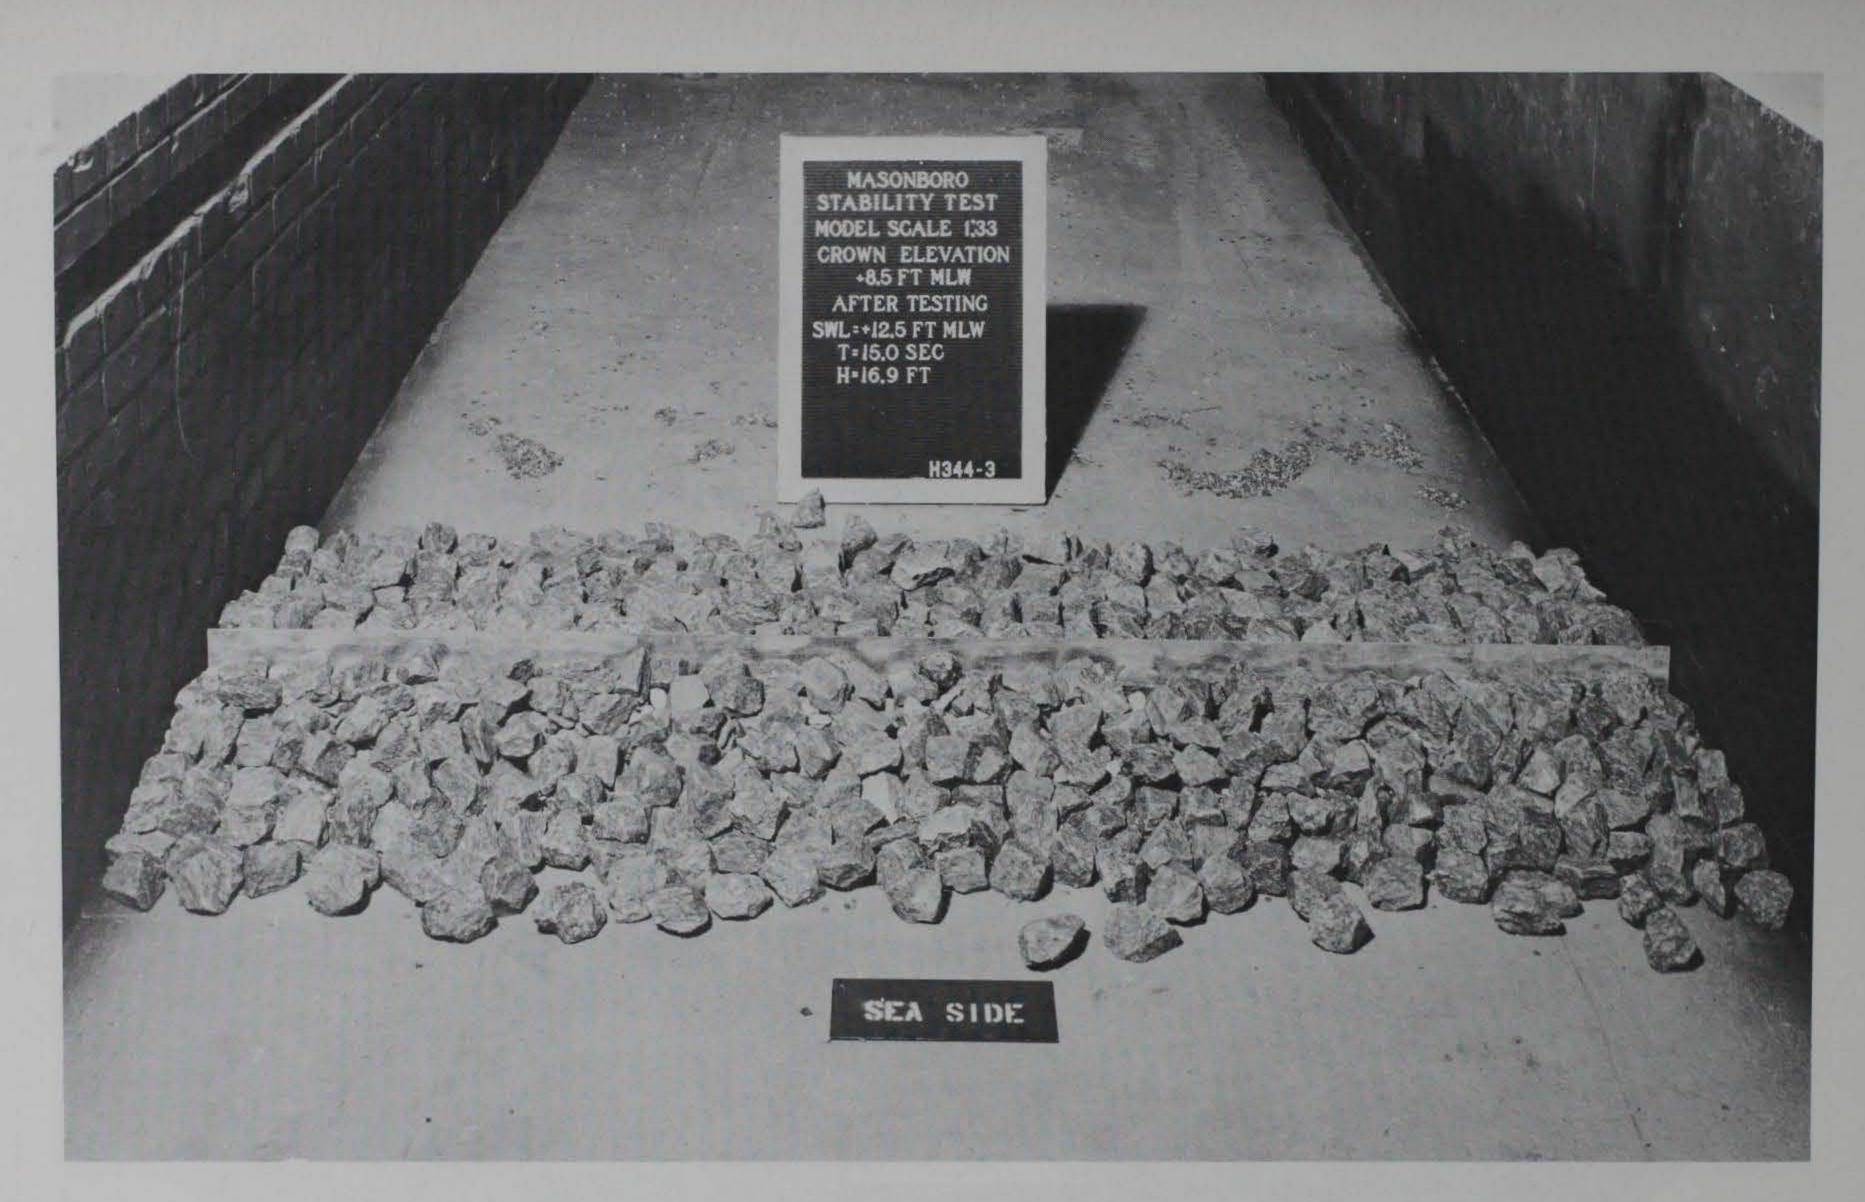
Sea-side view of Plan 1 after attack of 15-sec, 16.9-ft waves at an swl of +12.5 ft mlw for 4 prototype hr
